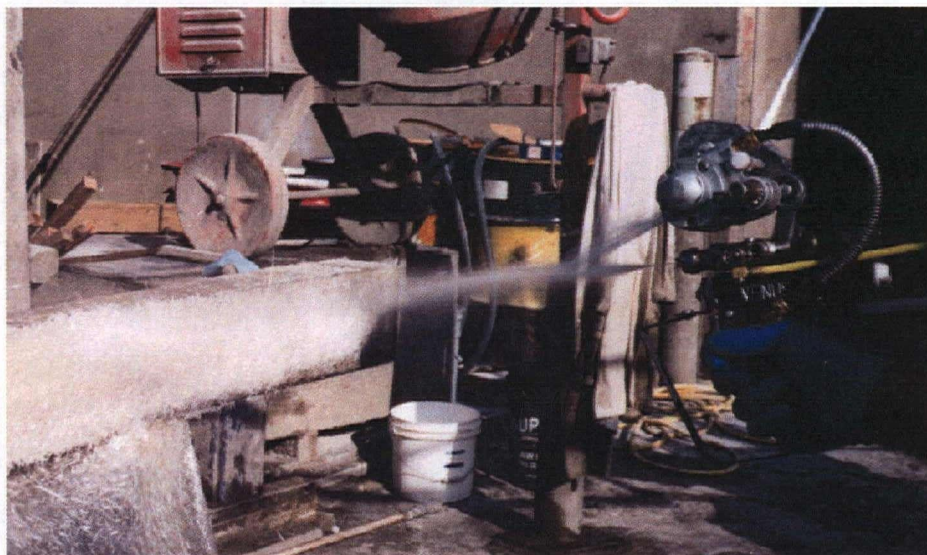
The Spray Equipment and Process of *Sprayed FRP
